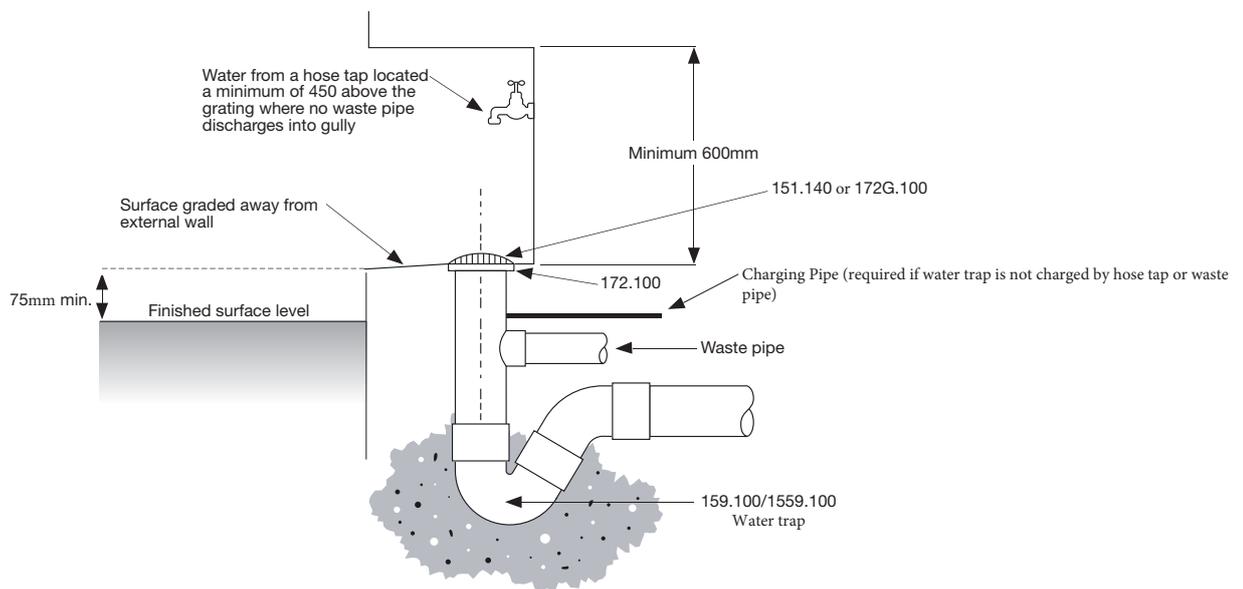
Typical positioning of Overflow Relief Gully outside a building (Ref AS/NZS 3500.2)
